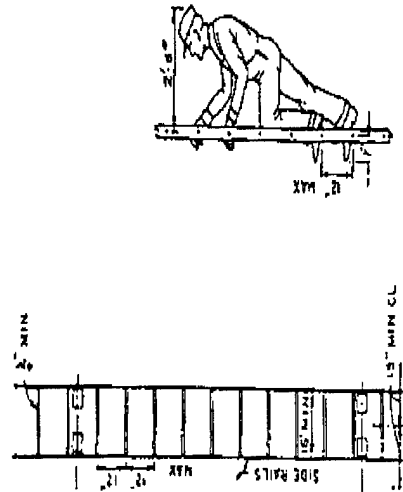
Rail Ladder With Bar Steel Rails and Round Steel Rungs
